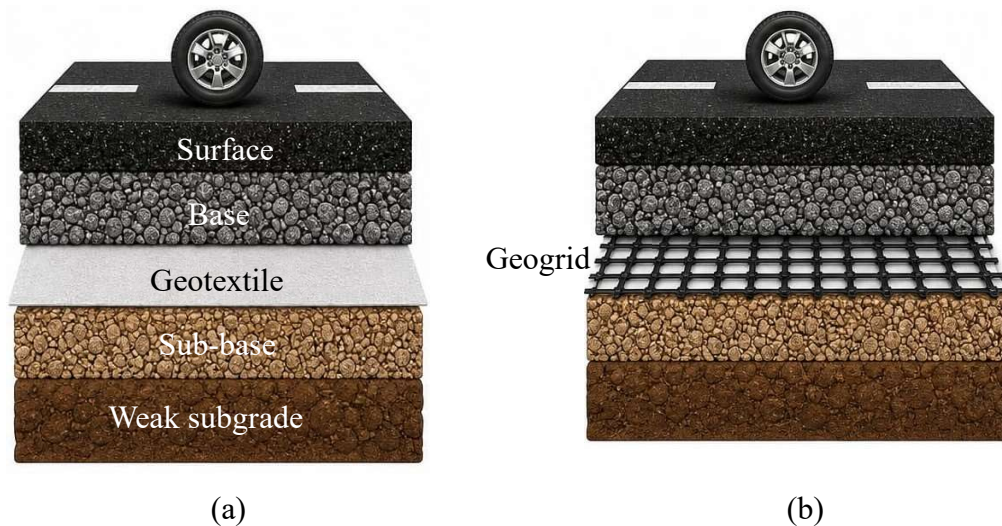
3D schematic illustration of flexible pavement system with (a) Geotextile reinforced
